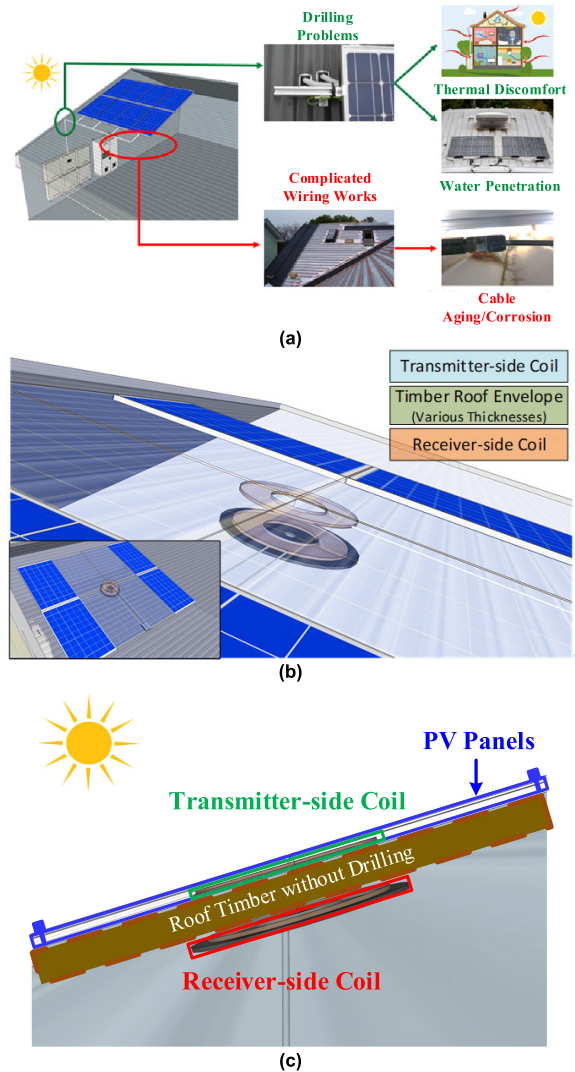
Construction overview of timber-rooftop PV system: (a) Conventional rooftop PV system; (b) Proposed rooftop PV-IWPT system; (c) The cross-section view of proposed PV-IWPT system.
